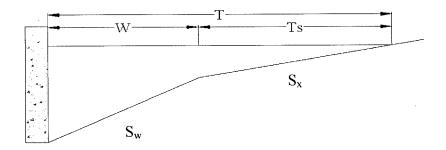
Composite Gutter Section (Johnson and Chang 1984)
